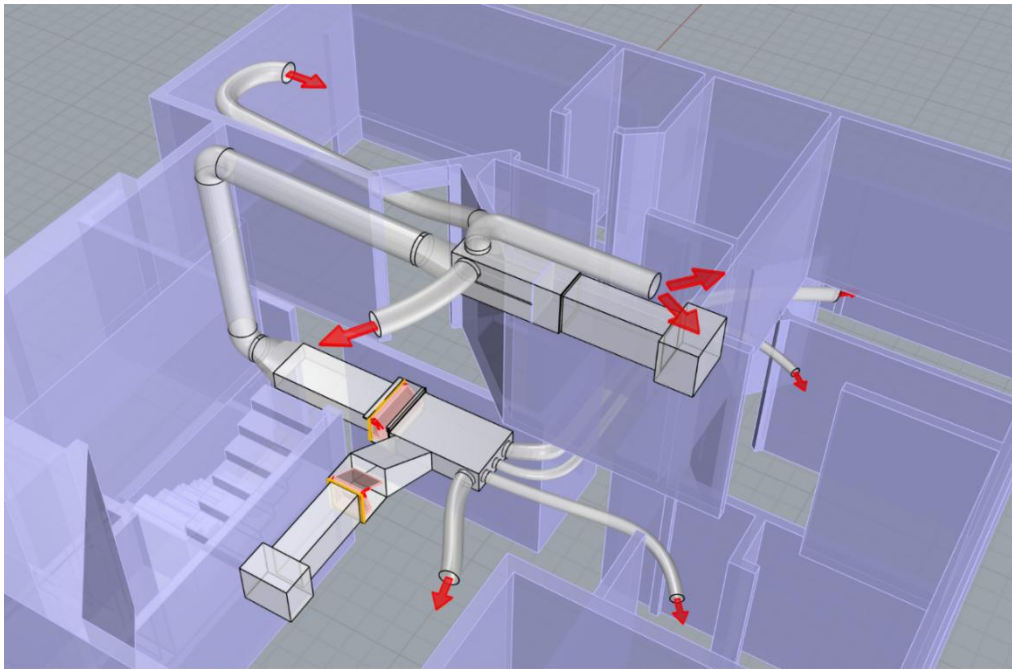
3D rendering of the ventilation ducts for the Two FCUs, one upstairs and one downstairs.
